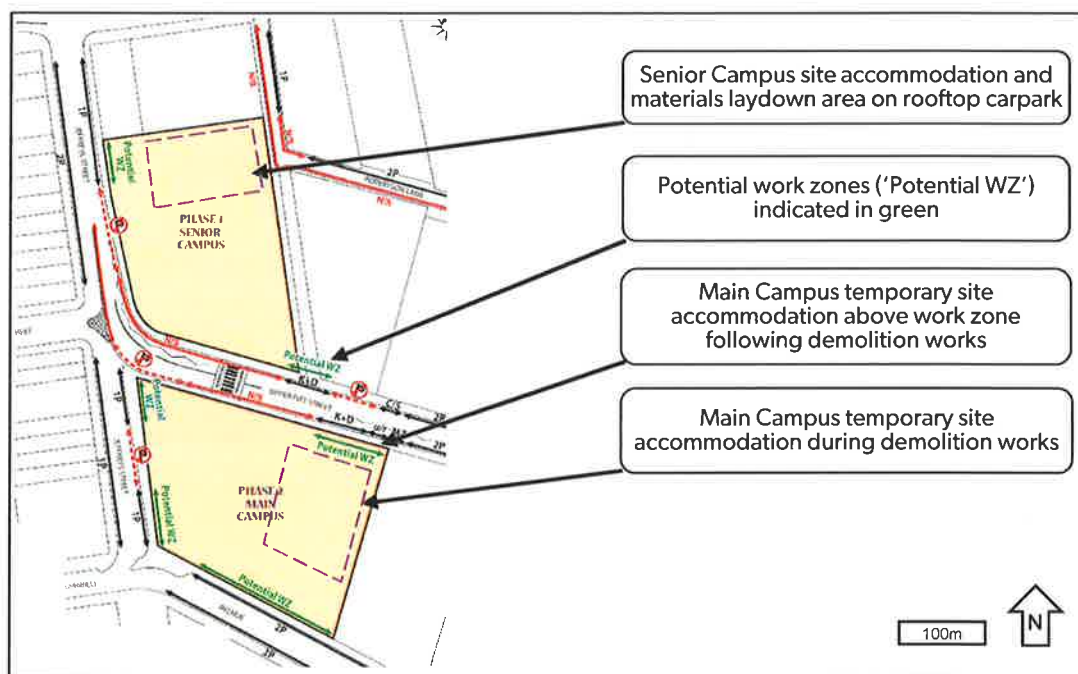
| Indicative site accommodation, layout areas and work zones for Stage 1 works
